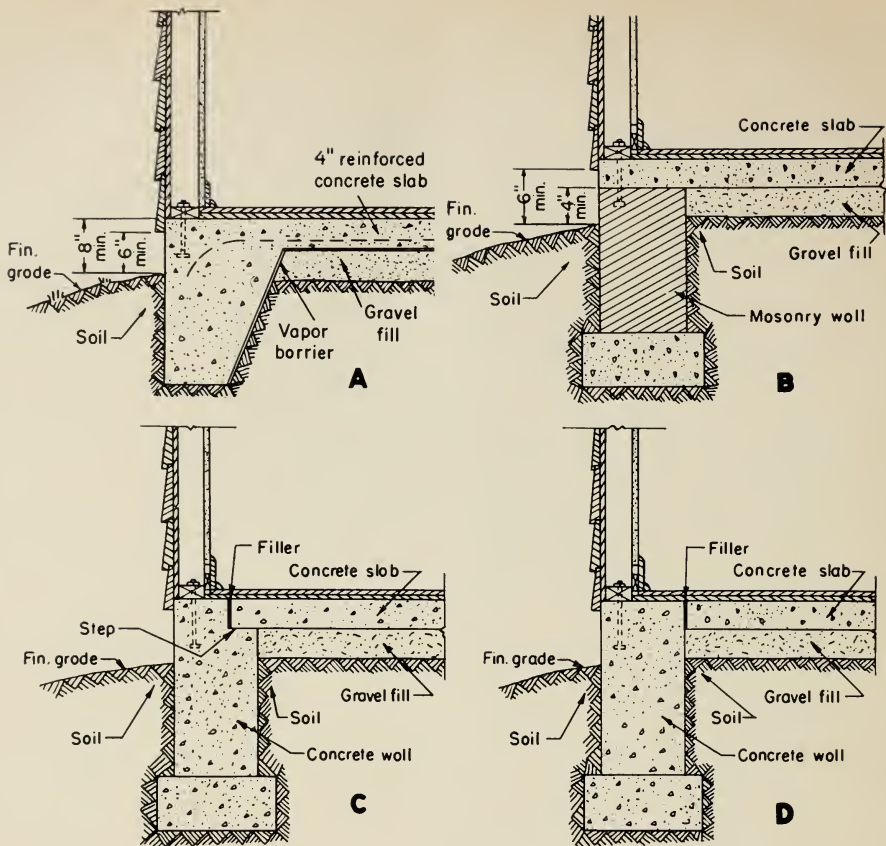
Slab-on-ground construction. A. monolithic; B. suspended slab; C, D. floating slab type of construction in which slab rests on a ledge of the foundation (C) or is independent of it (D). (From St. George *et al.*, 1963.) The "filler" in the expansion joints in C and D usually consists of a roofing grade coal-tar pitch or rubberoid bituminous sealer.
